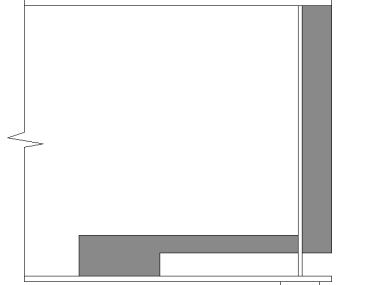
Recorded dimensions of H4 holes associated with W5 web corrosion pattern for beams with unique bearing stiffener
